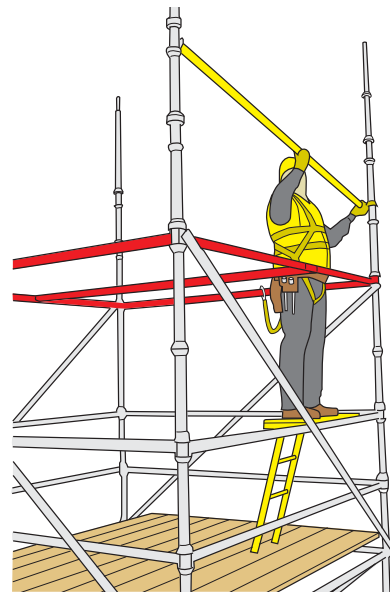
Scaffolder installing a guardrail in advance to the next lift from a scaffolders' step protected by the ledgers and transoms.
